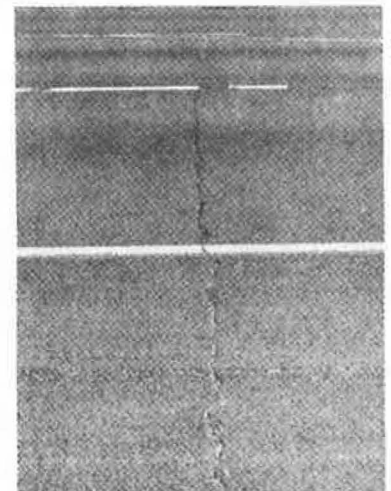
Typical reflection crack over transverse joint in concrete pavement.
